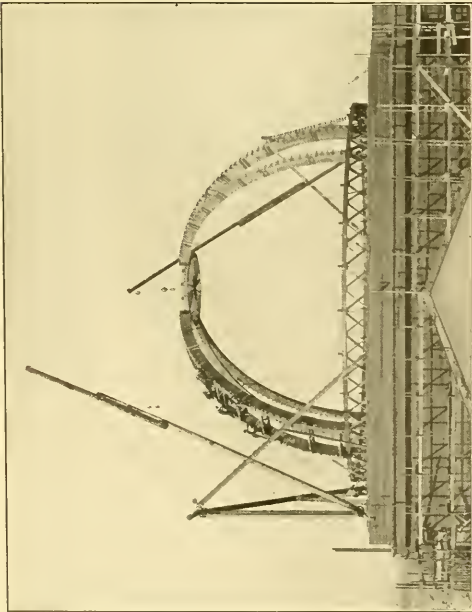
TYPICAL TIMBER DOME CONSTRUCTION
